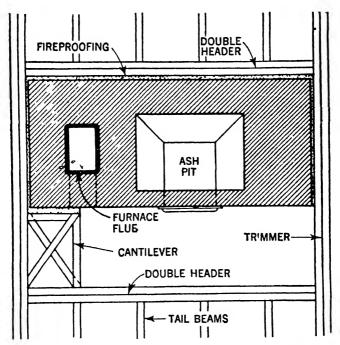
Showing a recommended method of floor framing around a fireplace header is more than 4 feet in length, it should be doubled as indicated. Headers upporting more than four tail beams should have ends supported in metal joist hangers. The framing may be placed one half inch from the chimney because the masonry is 8 inches thick.
